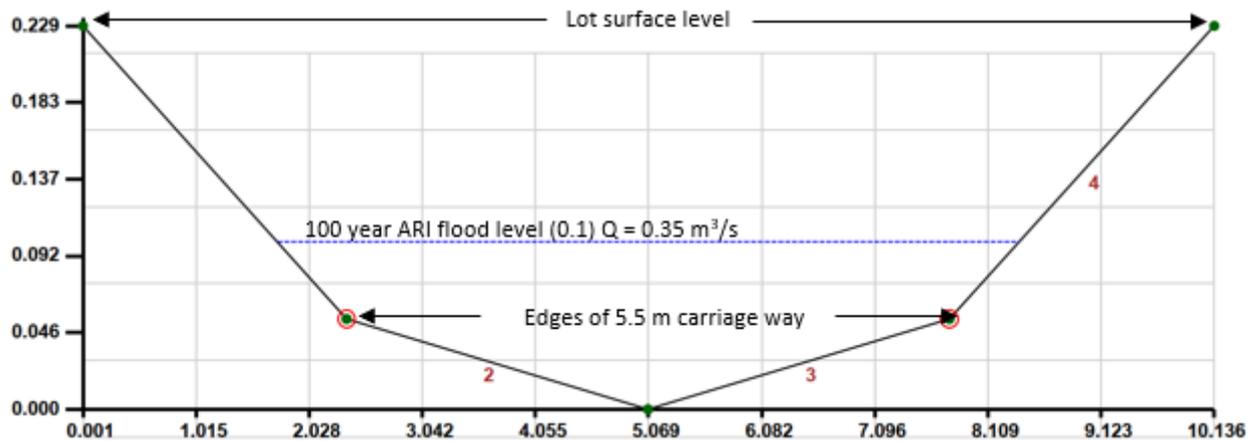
100 year ARI overland flow assessment of typical 5.5 m road cross section (1% longitudinal slope)
